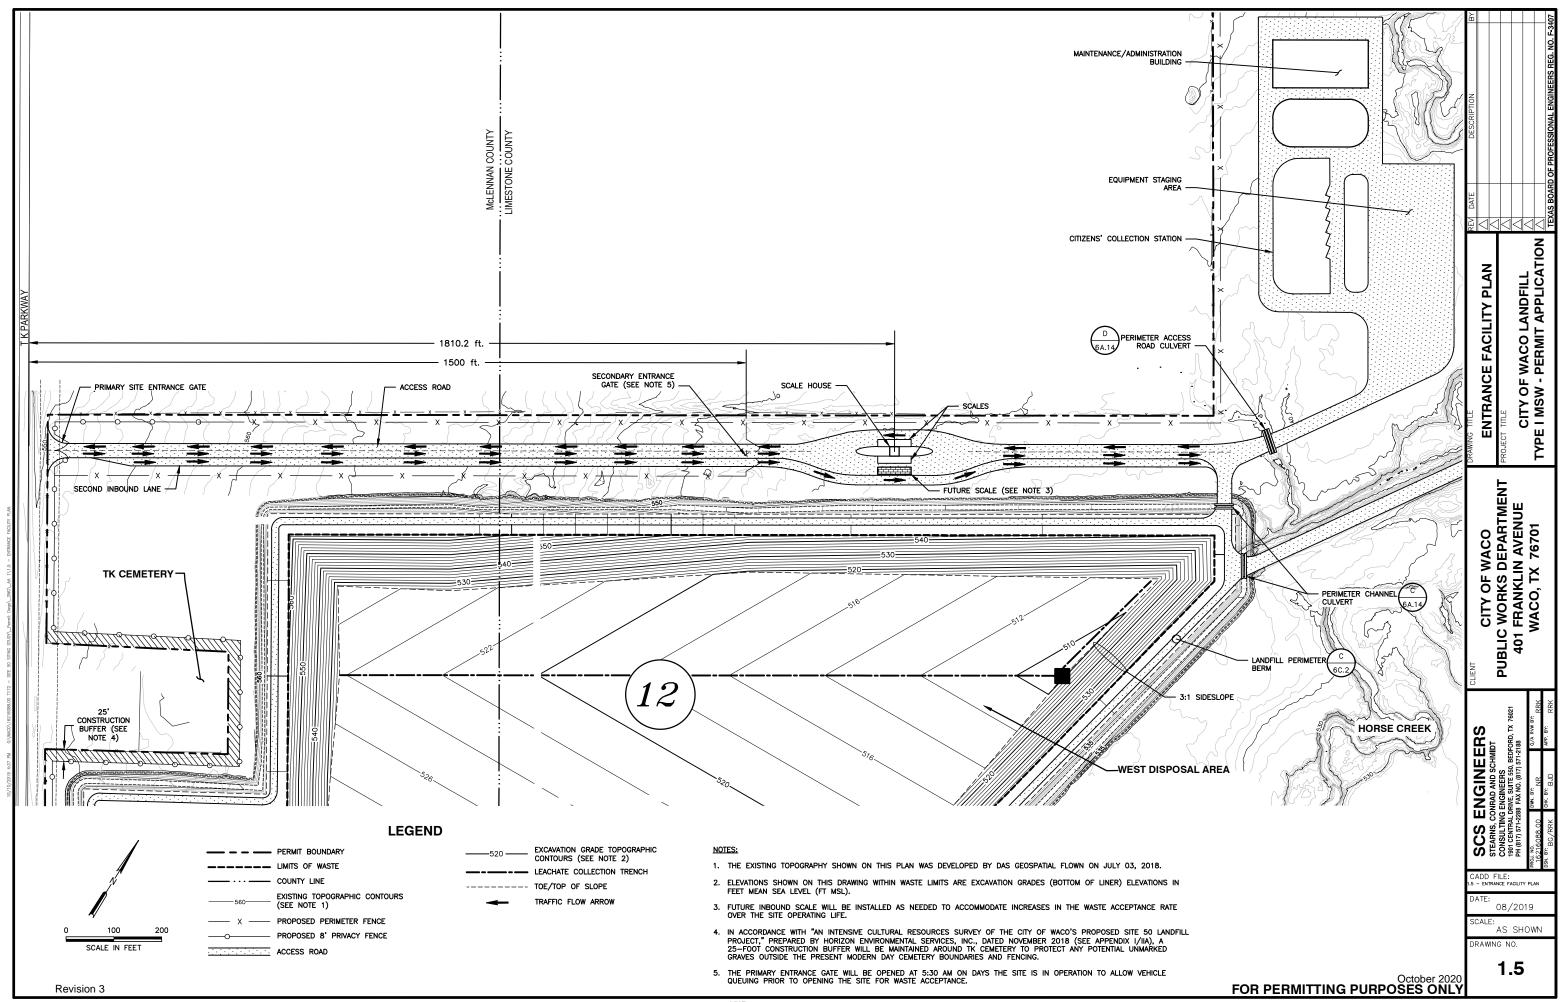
Queue Storage: Facility Entrance Plan Excerpt
